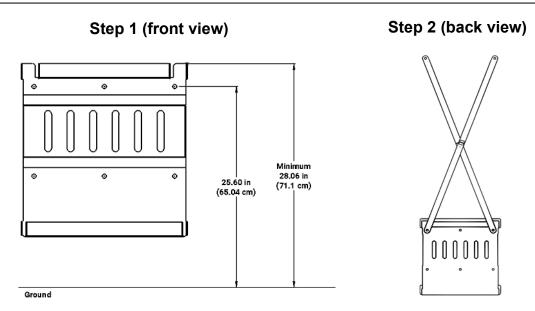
WallMount Installation with Conduit Box & 12/18kPV Steps 1 & 2
